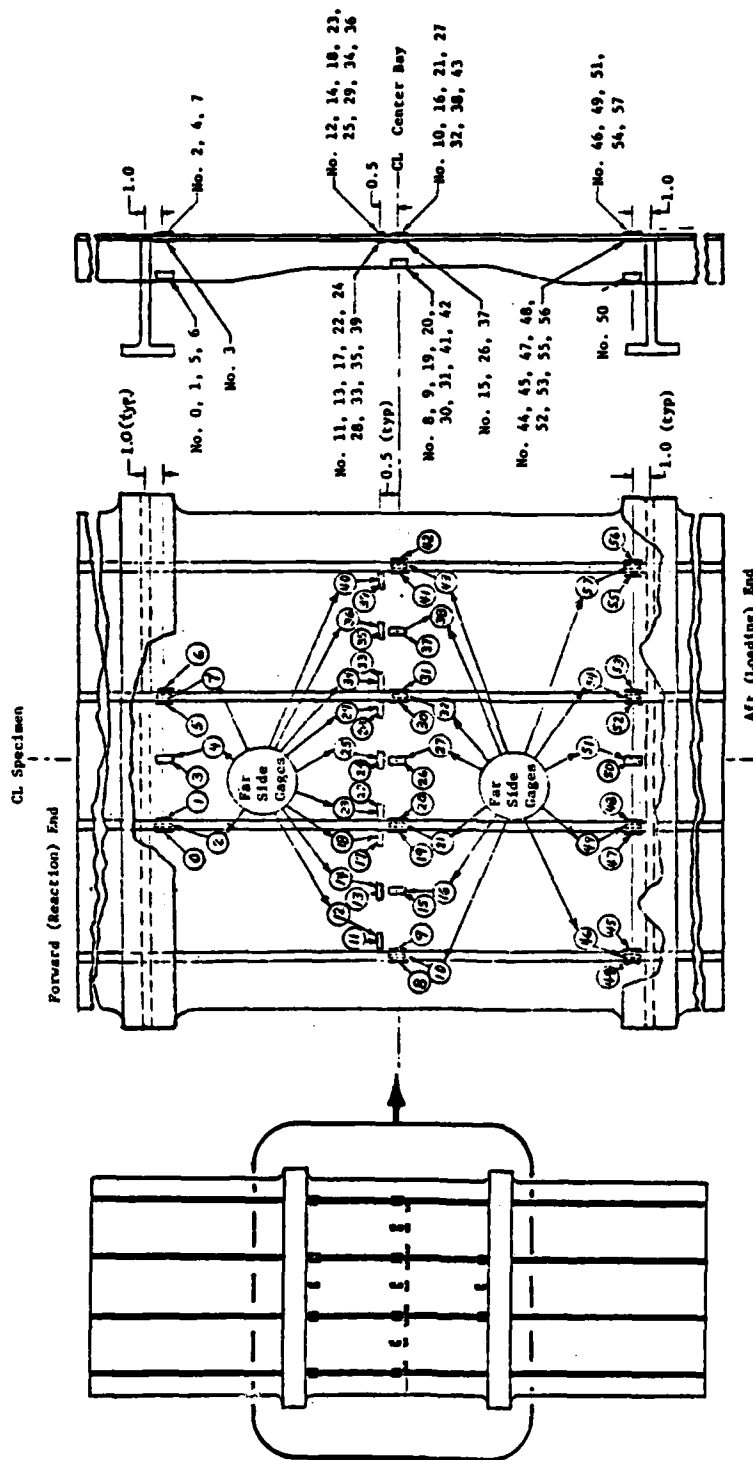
(790613-3) Detail of Deflection Transducer Installations and Removable Mounting Frame.
